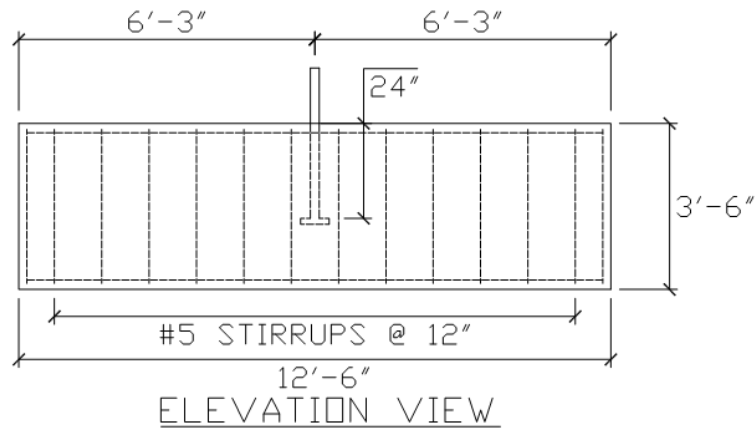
Elevation view of specimens with one No. 14 headed bar
